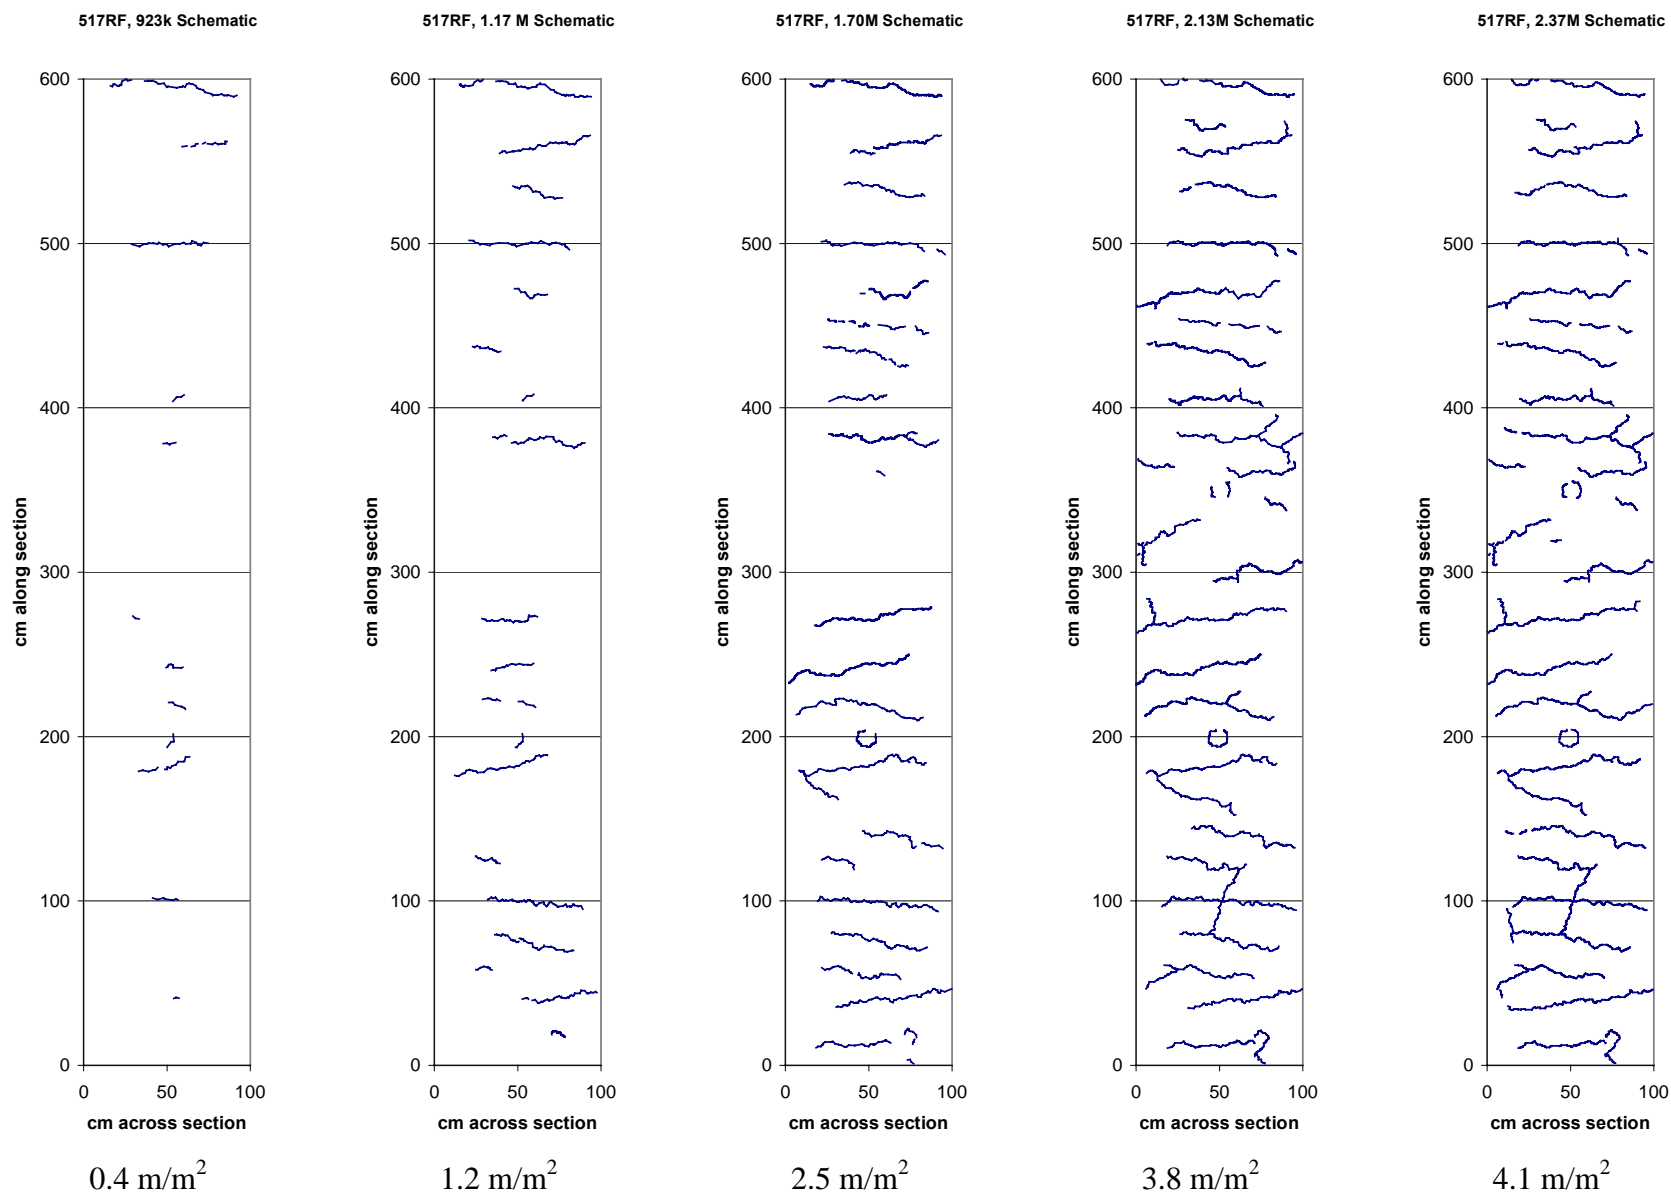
Crack development in Section 517 (undrained, DGAC overlay).
